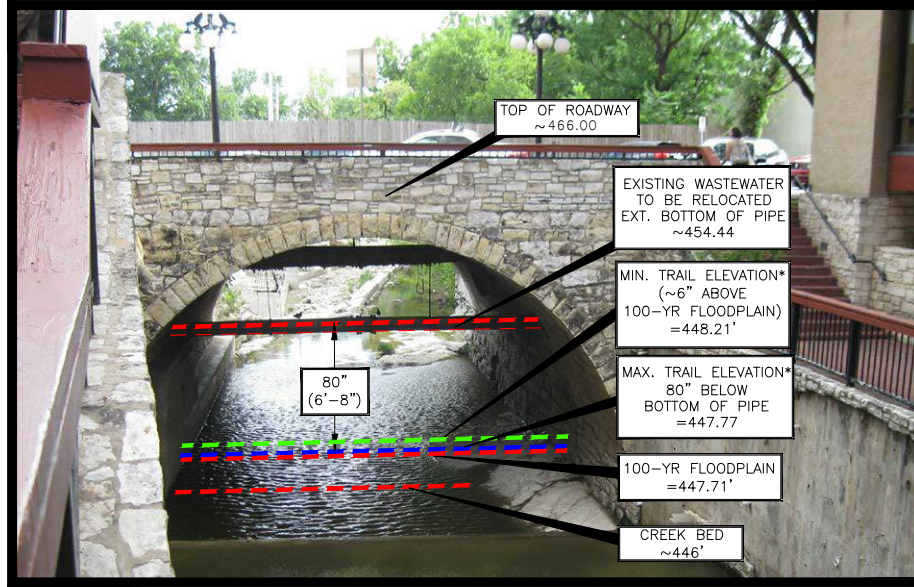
4th and 5th Street Bridge Cross Sections
